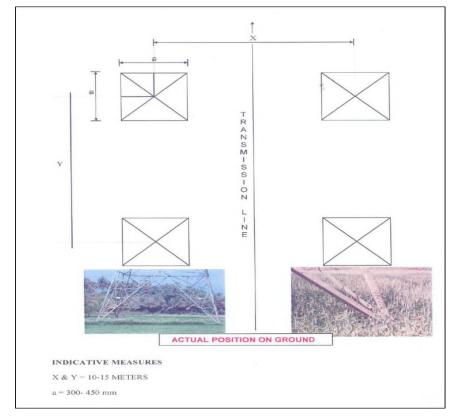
Typical plan of Transmission tower footings Source: ESPP 2009, Appendix XVI
